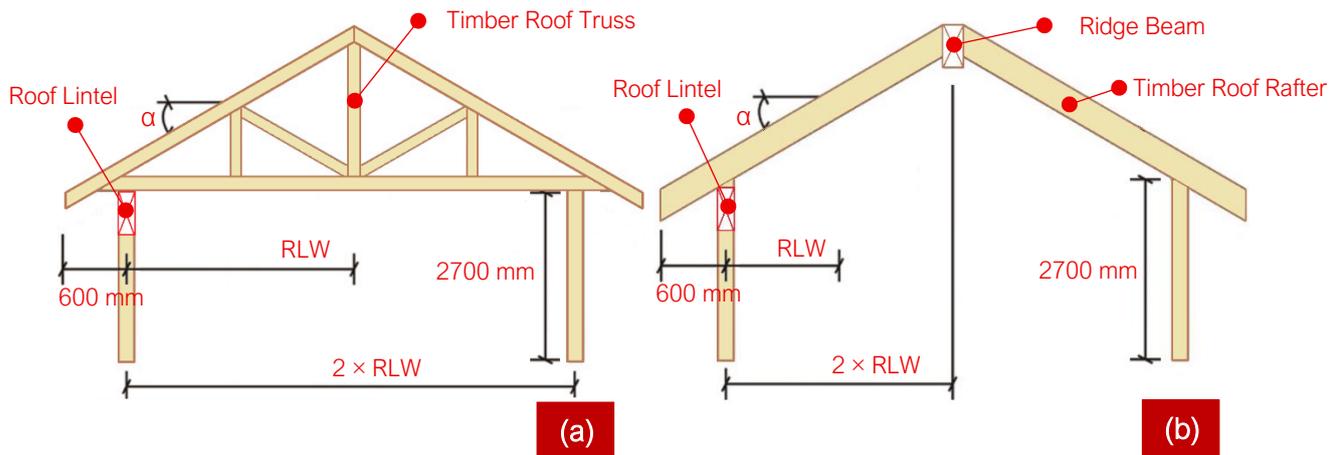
Red Stag Vertex₁₀ roof lintel beam; a) Timber roof truss, b) Timber roof rafter.
